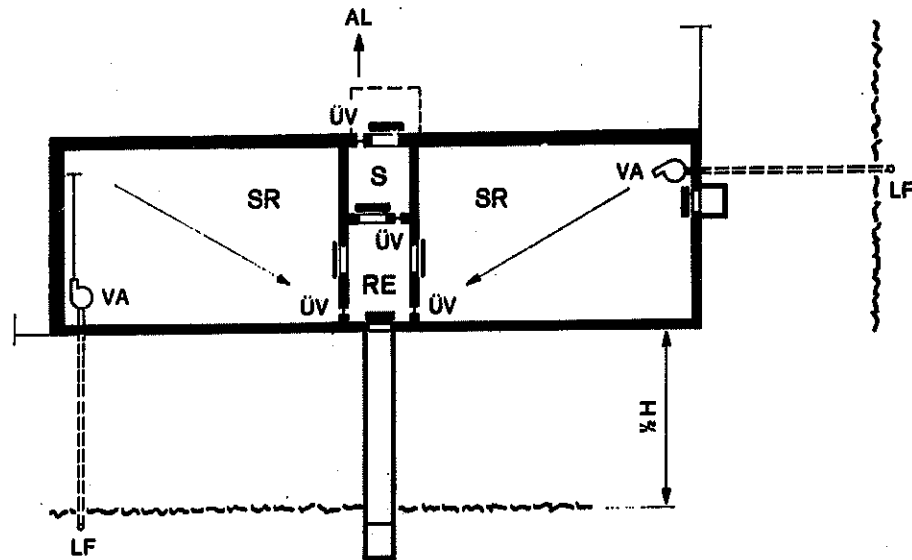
The arrangement of the ventilating equipment in a double celled shelter group (51 to 100 places).
